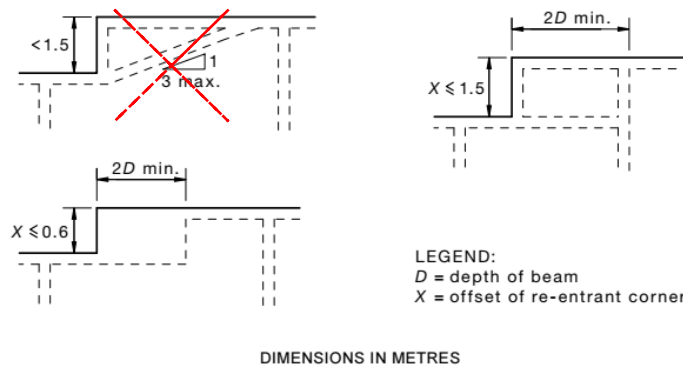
CONTINUITY OF FOOTING BEAMS (AS-2870)
